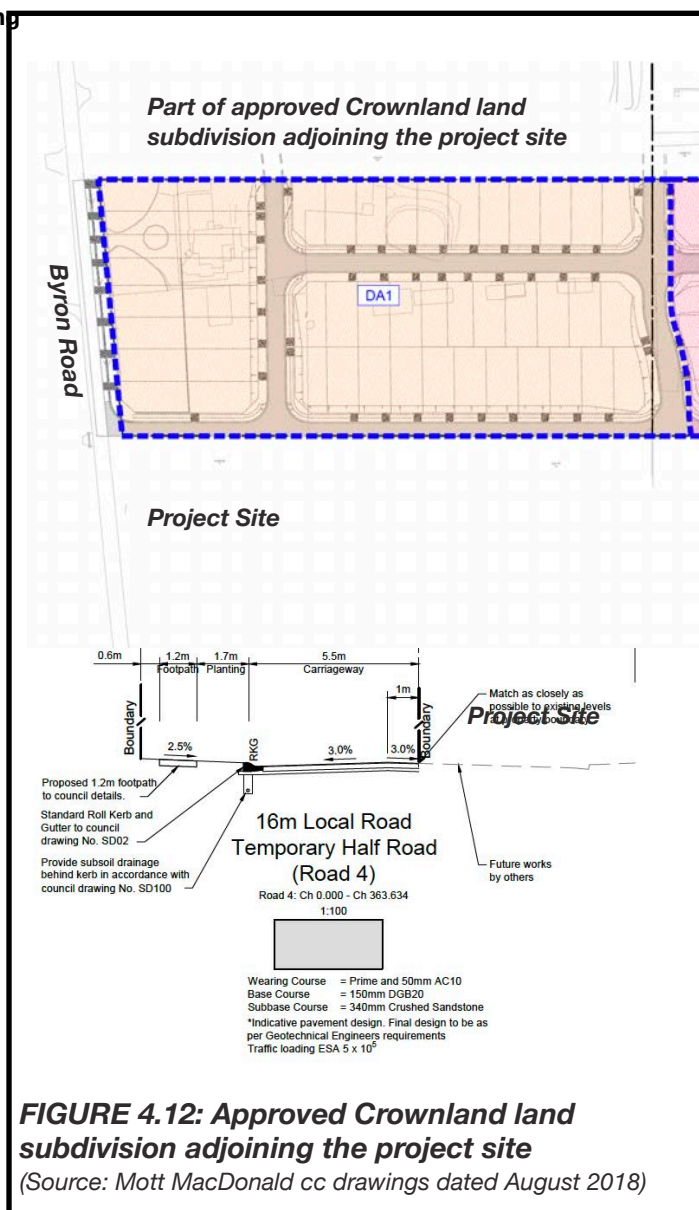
Approved Crownland land subdivision adjoining the project site
